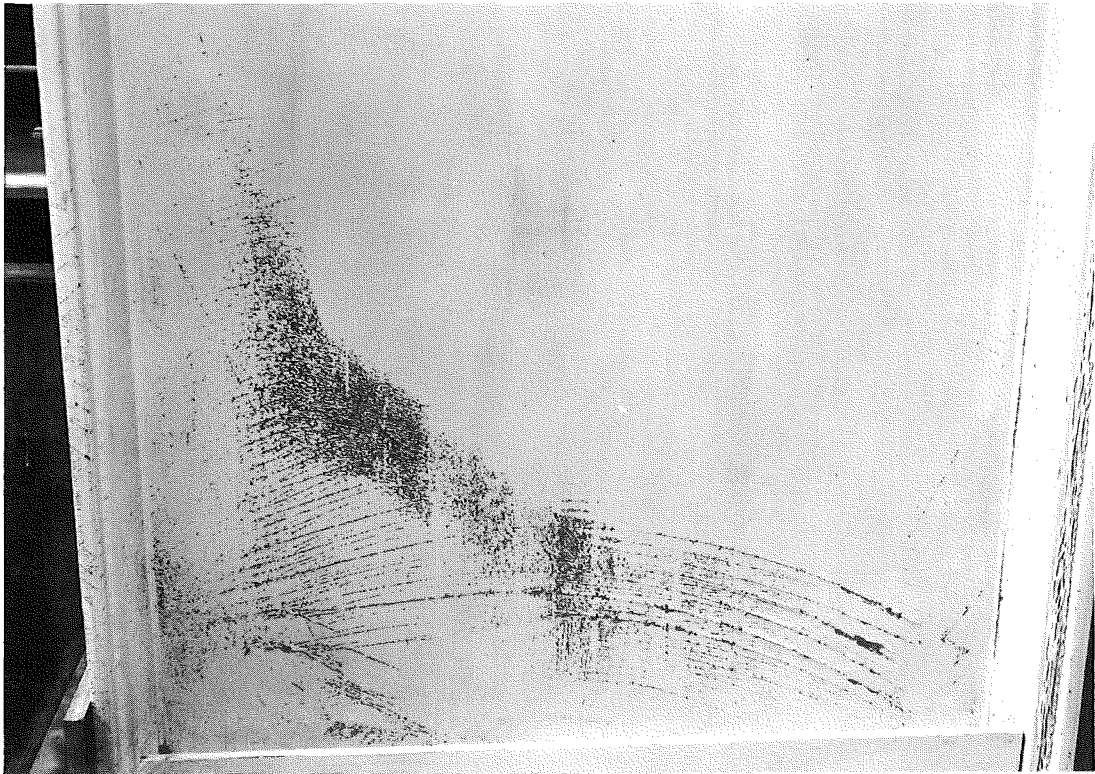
Detail of Failed Section, Girder E2, Test T1
